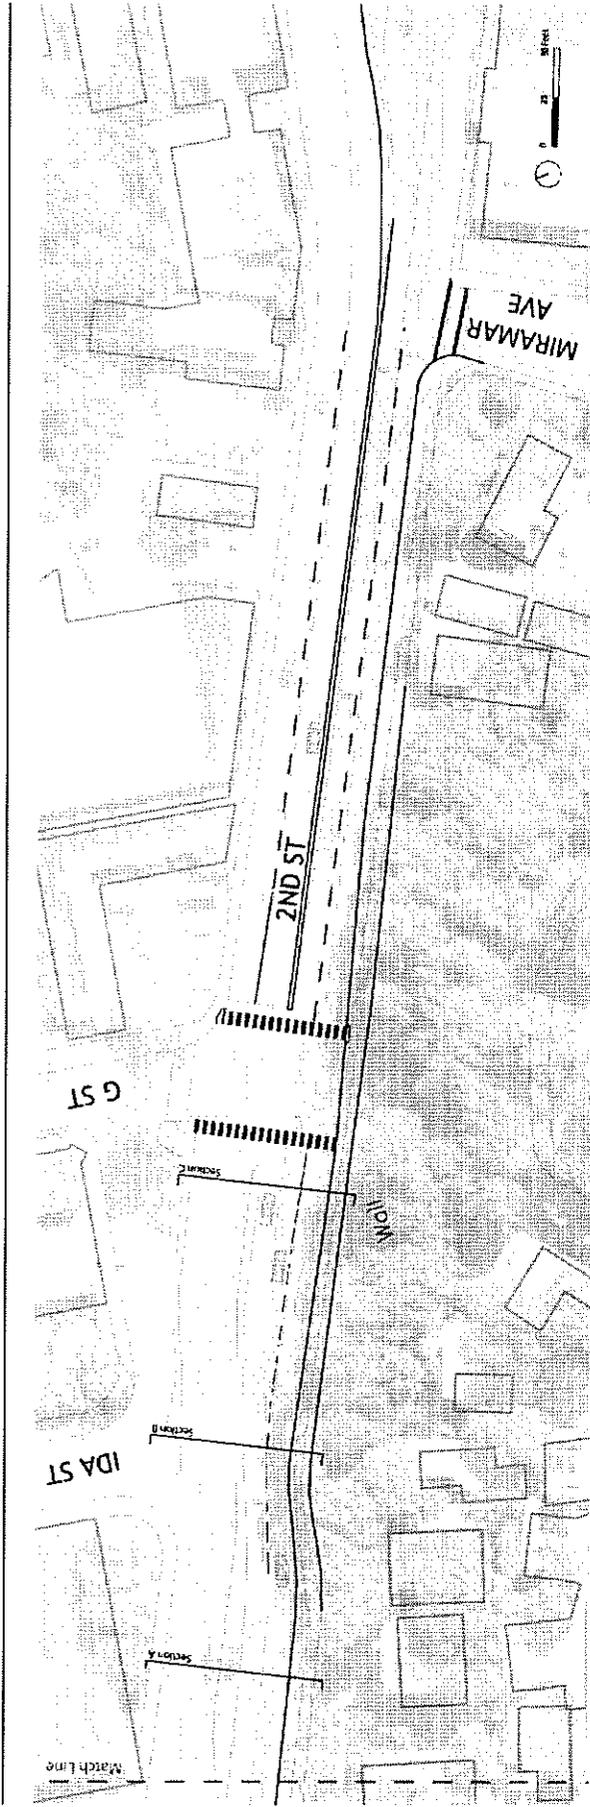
Plan View of Proposed Improvements for Project 12: Second Street (Second Street/Fourth Street Intersection to Miramar Avenue) (Eastern portion)
